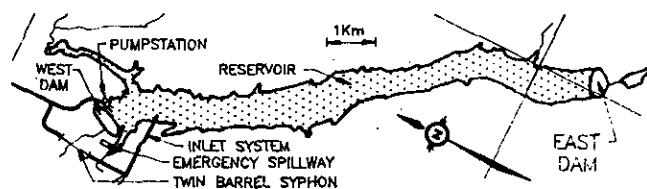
FORTY MILE COULEE PROJECT SITE PLAN
